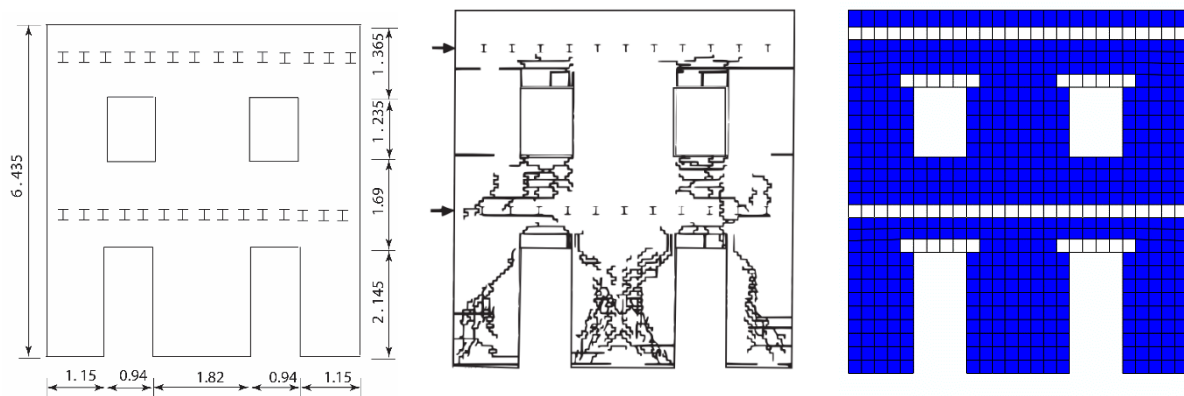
Façade of the “Pavia building” [25]: a) Geometry, b) Experimental damage pattern, c) Numerical model discretization.
